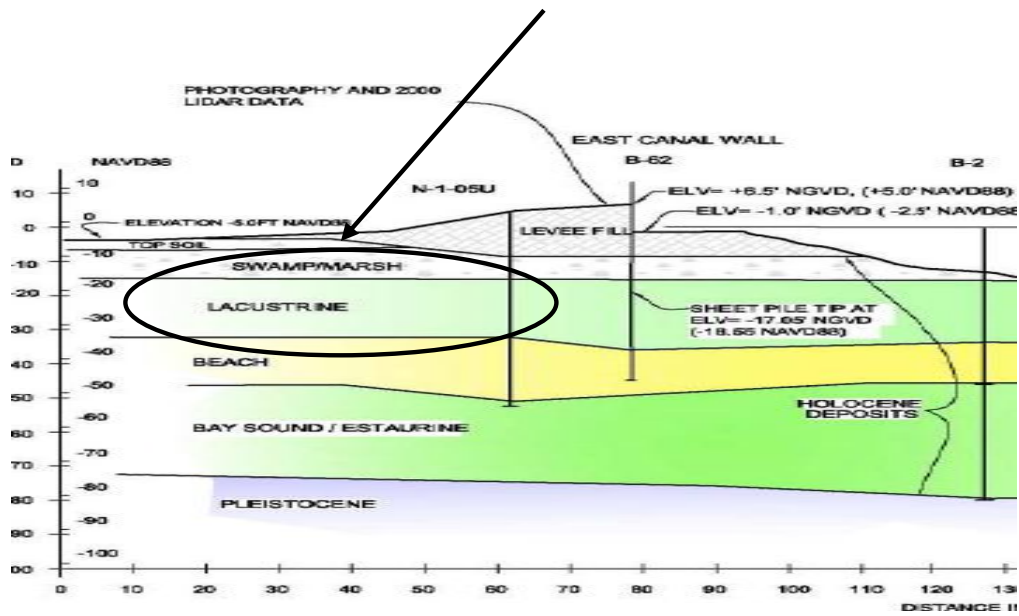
Cross section and soil profile for 17th street canal (Adapted from IPET 2007)
